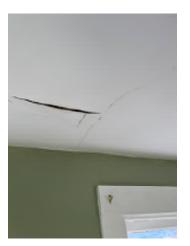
Cracked Sheetrock and Peeling Paint on the Ceiling.
